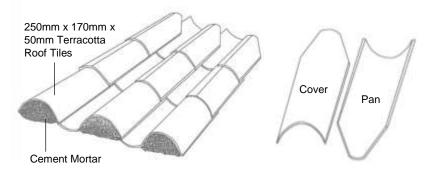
Pan-and cover roof tile system in *Istana Bandar*.
